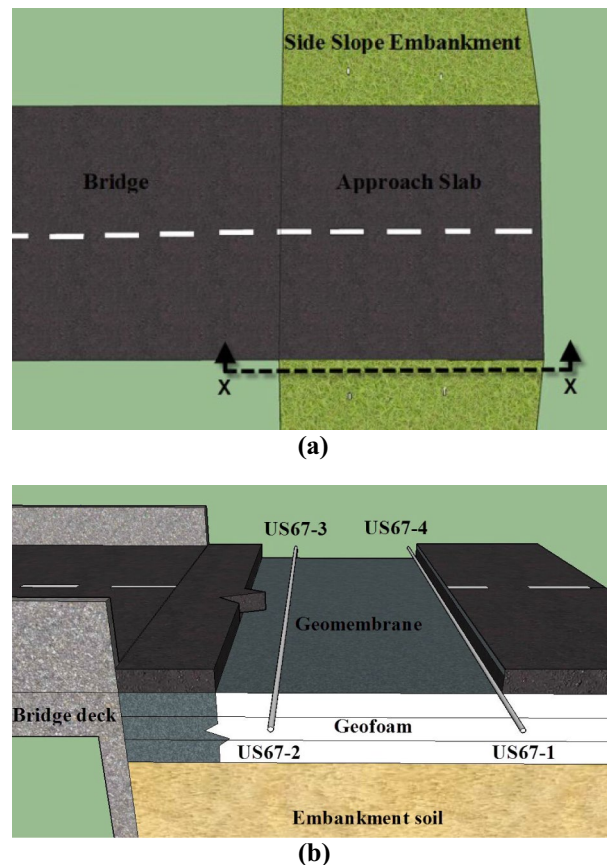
Soil–geofoam–bridge at US 67: a top view; b cross-section view
